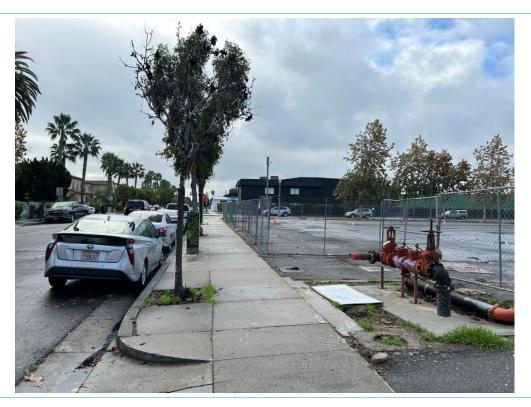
Overview from corner of Santa Ana Street, and Olive Street, facing north.
